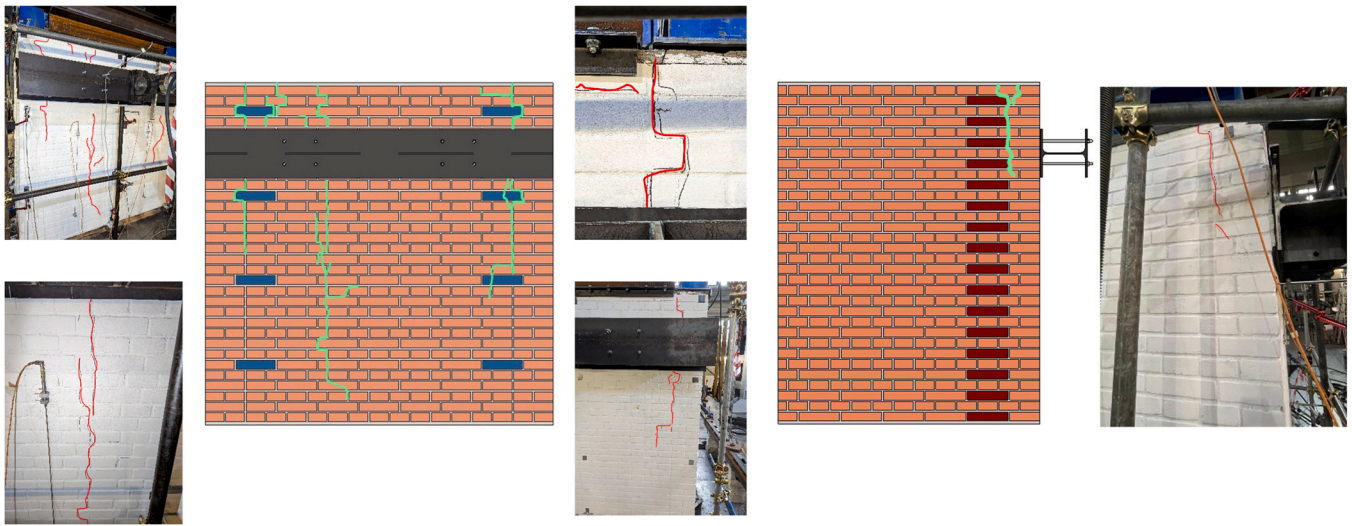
Crack details after FME of URM specimen: front view (left), and left side view (right).
